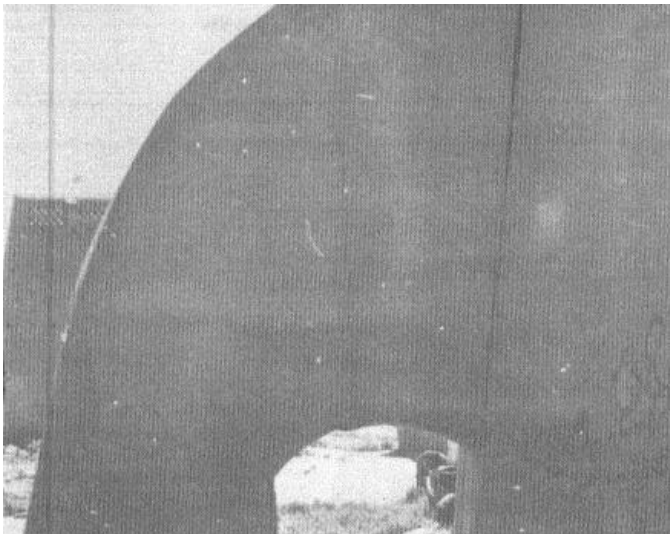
Adobe buttress of adobe icehouse shows separation and continues to support loading.
